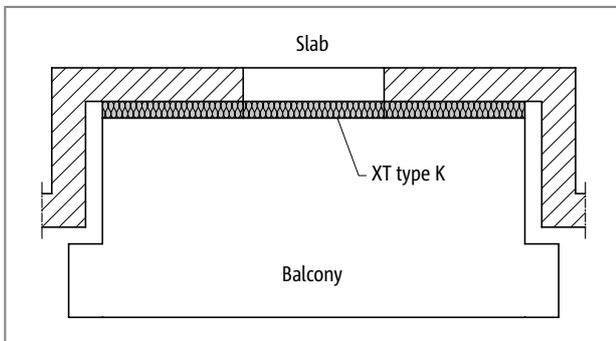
Schöck Isokorb® XT type K: Balcony with facade recess
